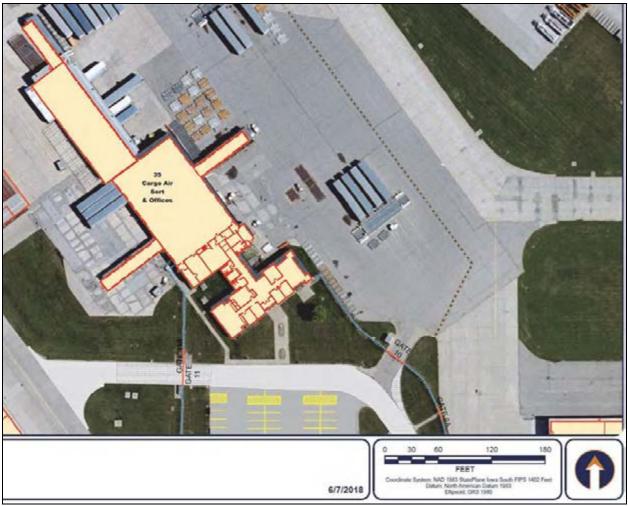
Plan and layout of Building 35 indicating the original interior walls are extant when compared to the 1970 plan sheet (see Iowa Site Inventory Form 77-11872 in Appendix).
